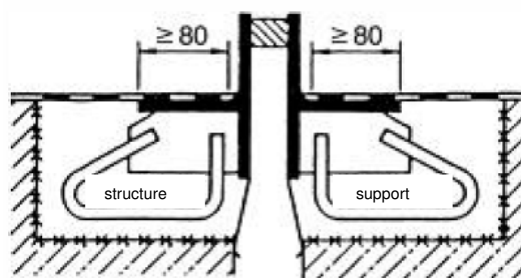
Connection of waterproofing on the steel edge area of the expansion joint
